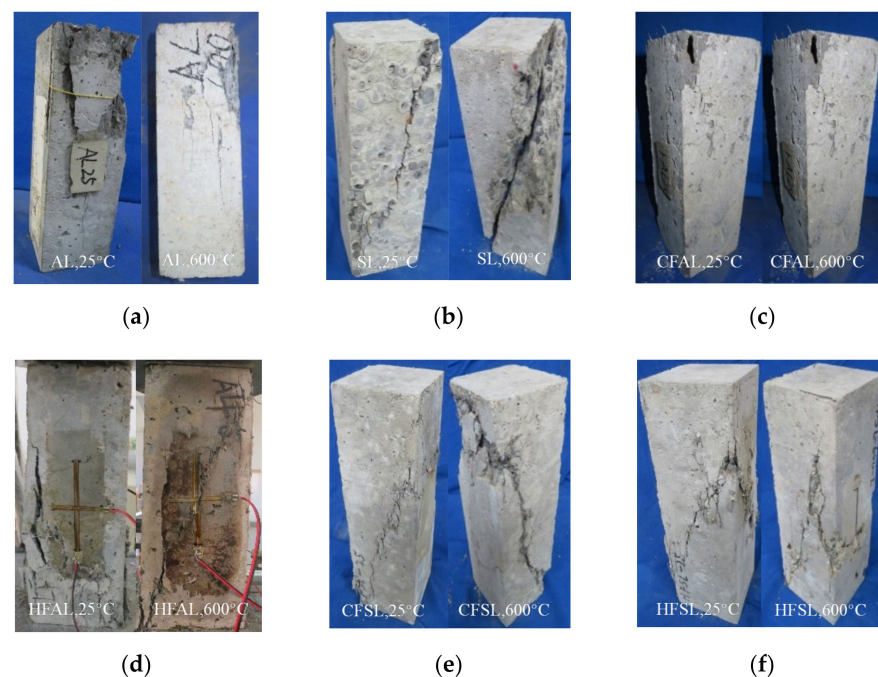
Failure mode of mixes after compression: (a) All-lightweight concrete (ALWC); (b) Semi-lightweight concrete (SLWC); (c) All-lightweight concrete with crimped shape steel fiber (CFAL); (d) All-lightweight concrete with Hooked end steel fiber (HFAL); (e) Semi-lightweight concrete with crimped shape steel fiber (CFSL); (f) Semi-lightweight concrete with hooked end steel fiber (HFSL).
